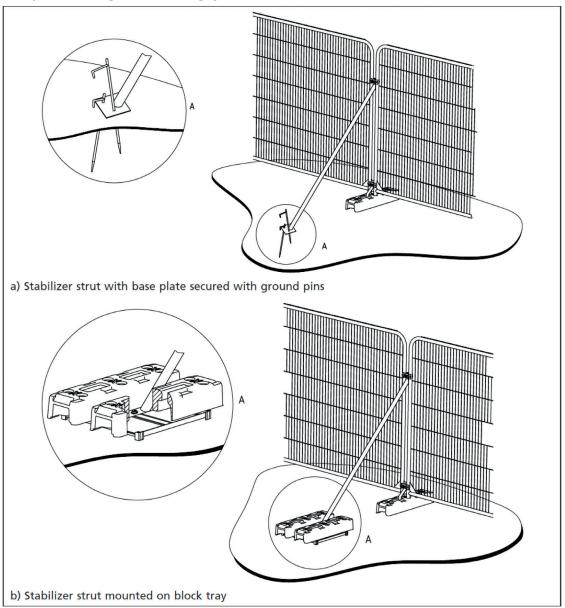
Tree Protection Detail (Herras type fencing or similar approved.
